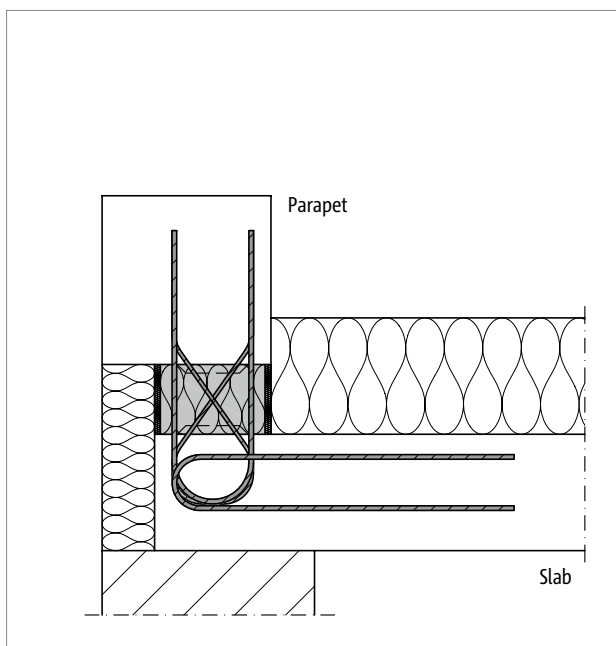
Schöck Isokorb® XT type A: Connection to a parapet (type A-MM1-VV1)
